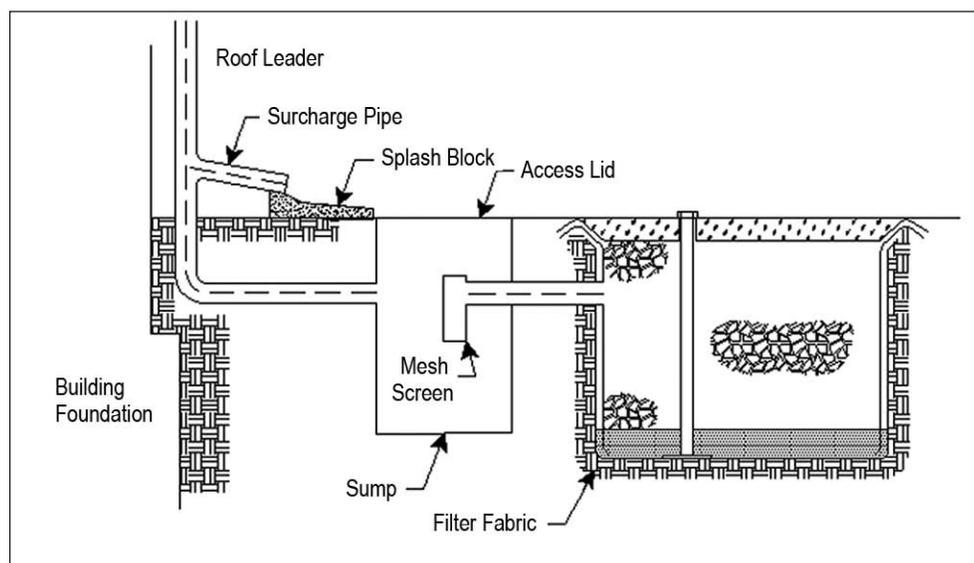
Underground pretreatment facility and infiltration trench for treating rooftop runoff.
